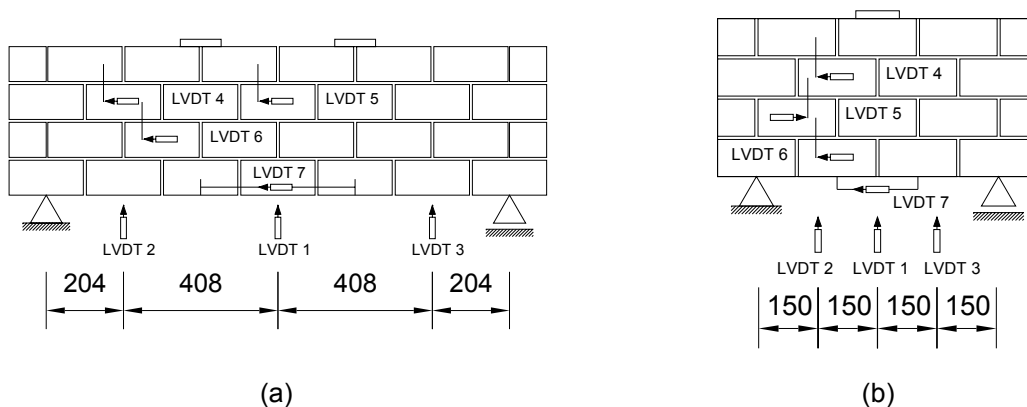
Instrumentation of the masonry beams: (a) four point load tests and (b) three point load tests (dimensions in mm).
